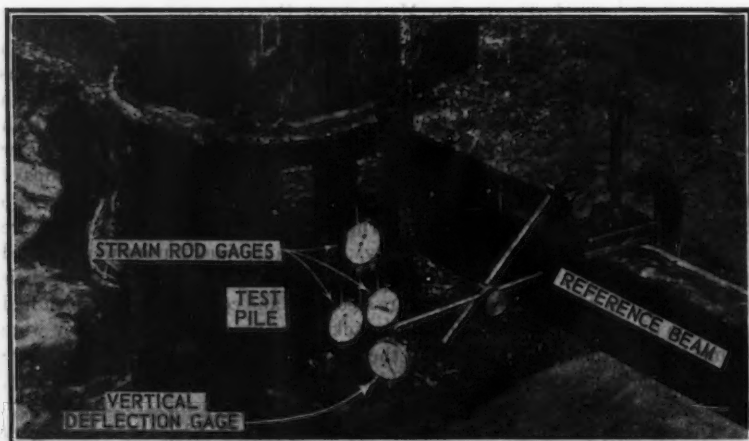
TYPICAL ARRANGEMENT OF REFERENCE BEAM, VERTICAL DEFLECTION GAGES, AND STRAIN-ROD GAGES
